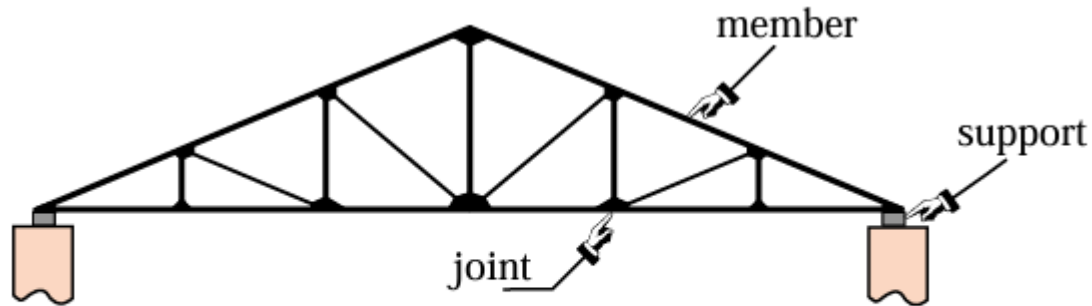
An actual plane truss structure. That shown is typical of a roof truss used in residential building construction.
